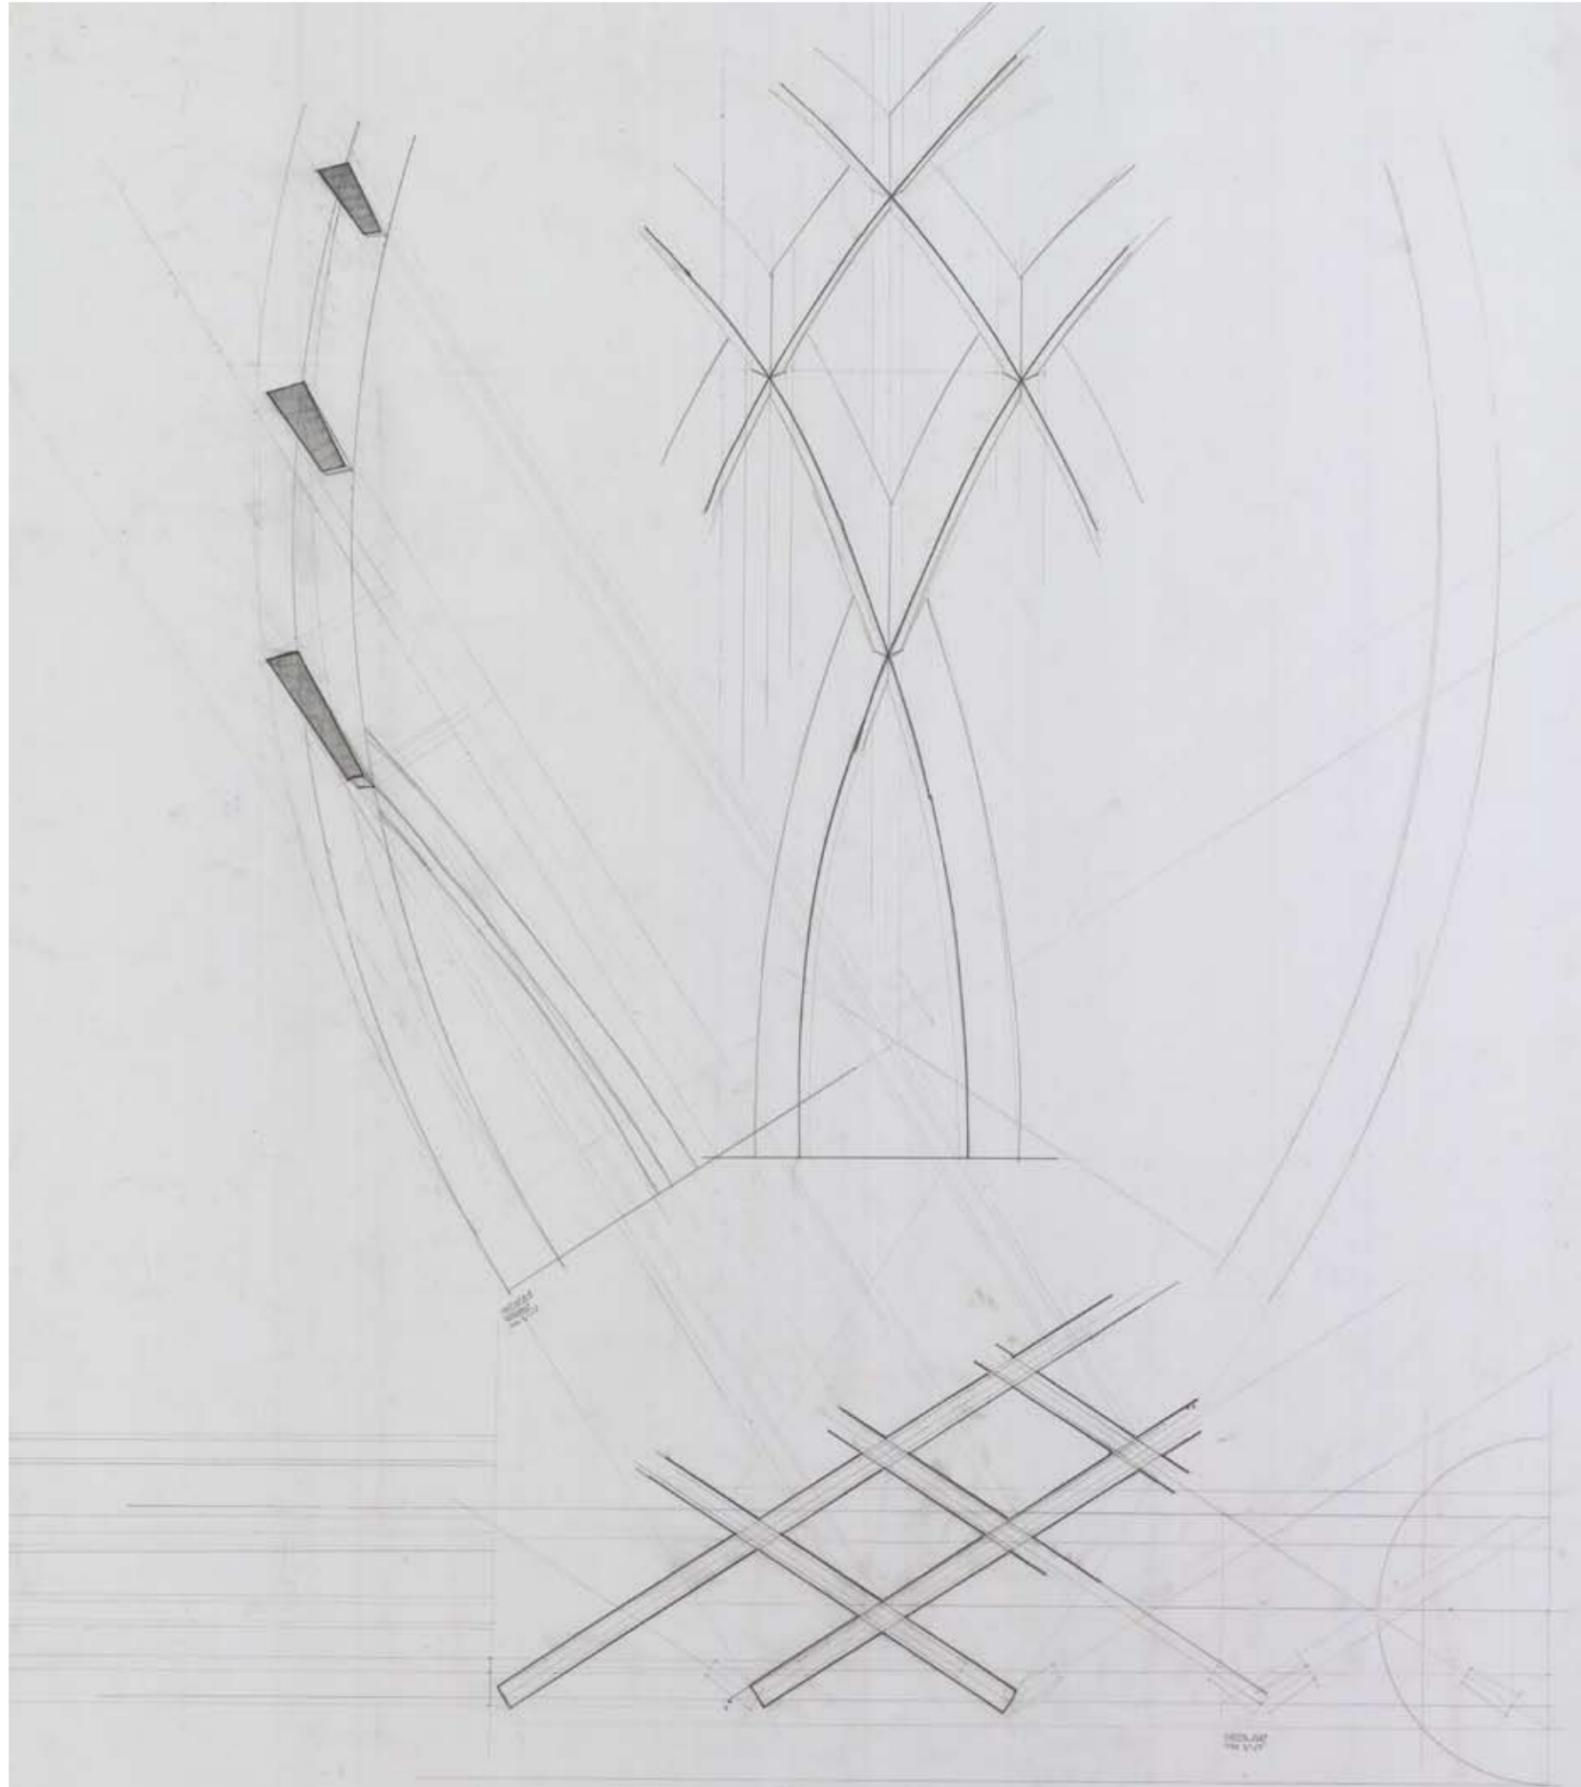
Rib Construction Partial Plan, Section and Elevation
